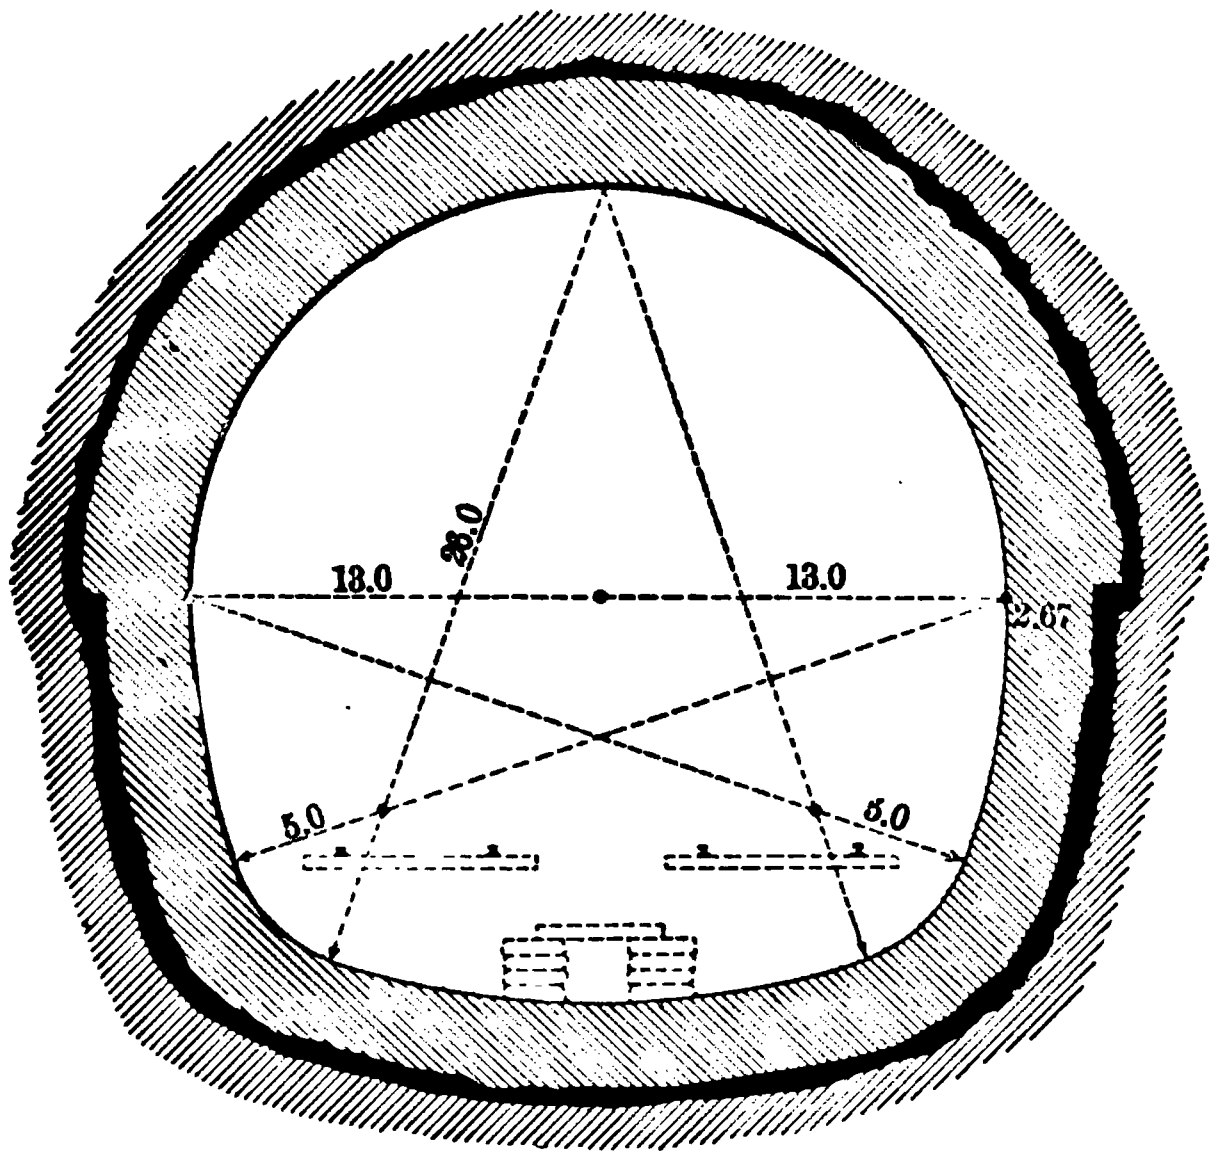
HOOSAC TUNNEL. SECTION THROUGH SOFT GROUND.
